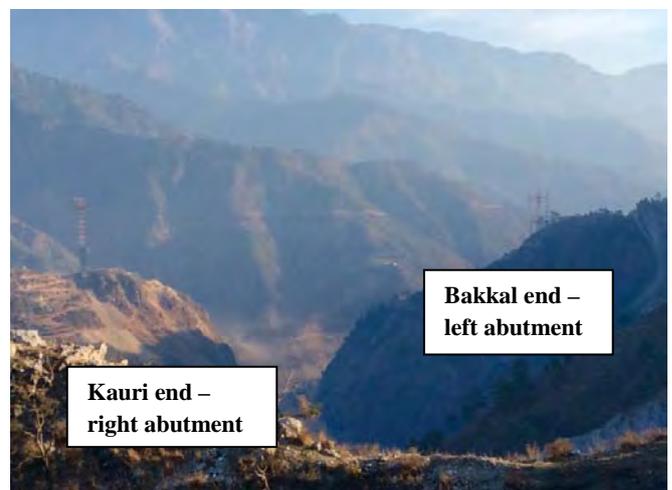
Proposed Bridge Site near Bakkal and Kauri villages
